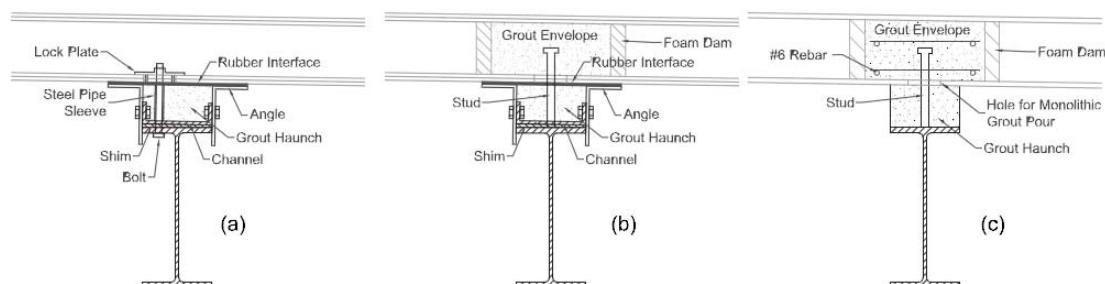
Deck to girder connections: a) Bolt and lock plate used for deck A b) Shear stud used for deck A c) Shear studs used for deck B (Brown & Berman, 2010)
